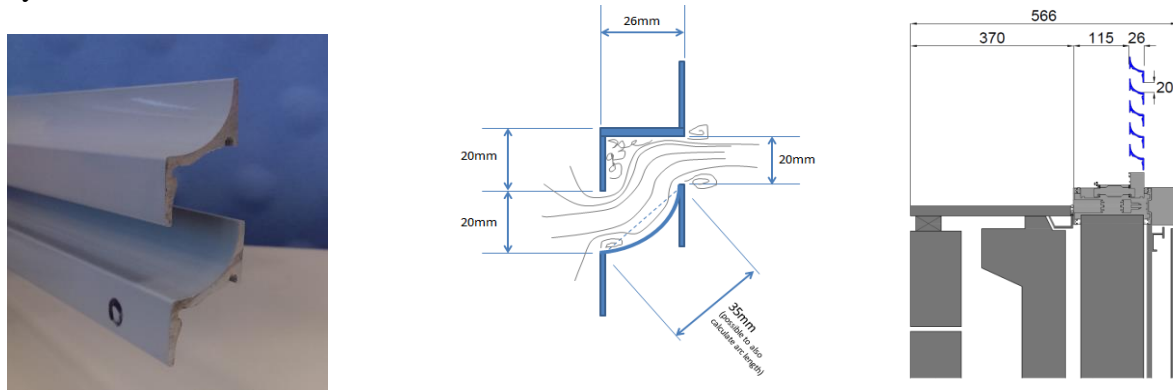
Slot louvre component details (a) sample louvre profile, (b) opening dimensions (c) installation
